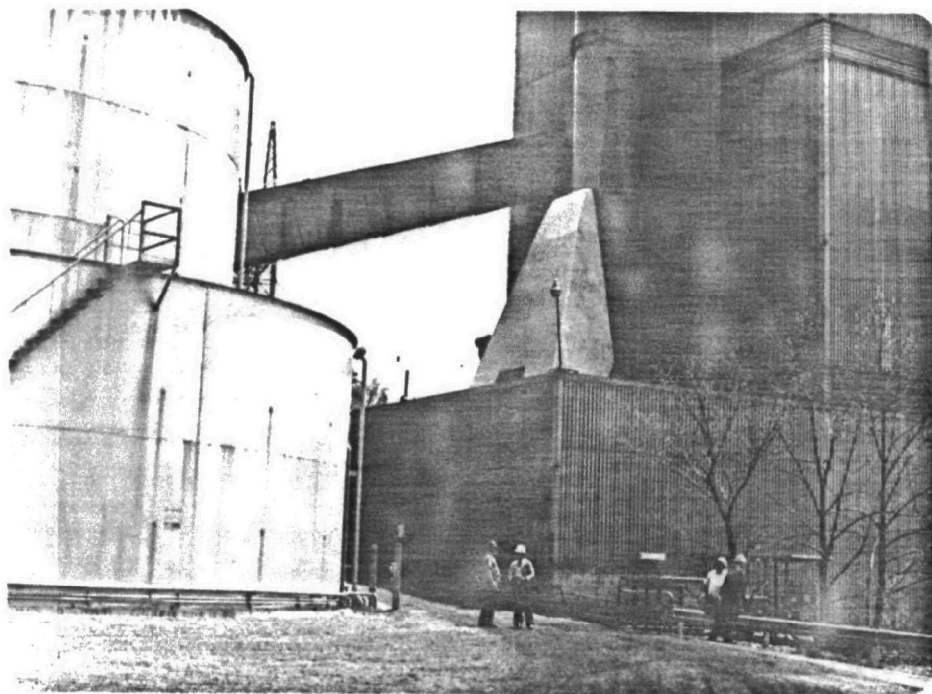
View from ground level facing southeast showing a portion of the oil storage facilities, boiler duct tie-in to the stack, and the coal conveyor.
